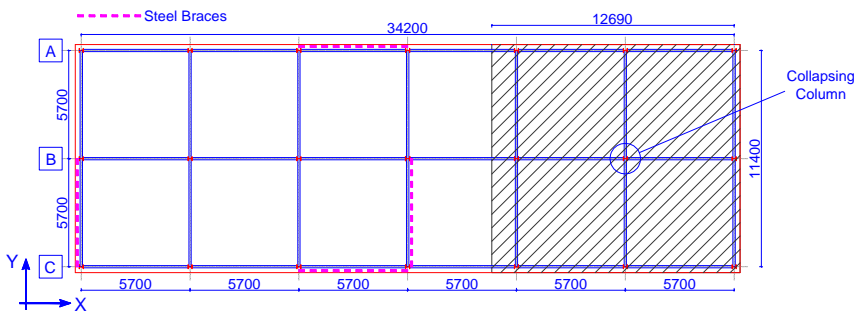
Floor-framing plan of case study structure - Symmetric configuration (dimensions in mm).
